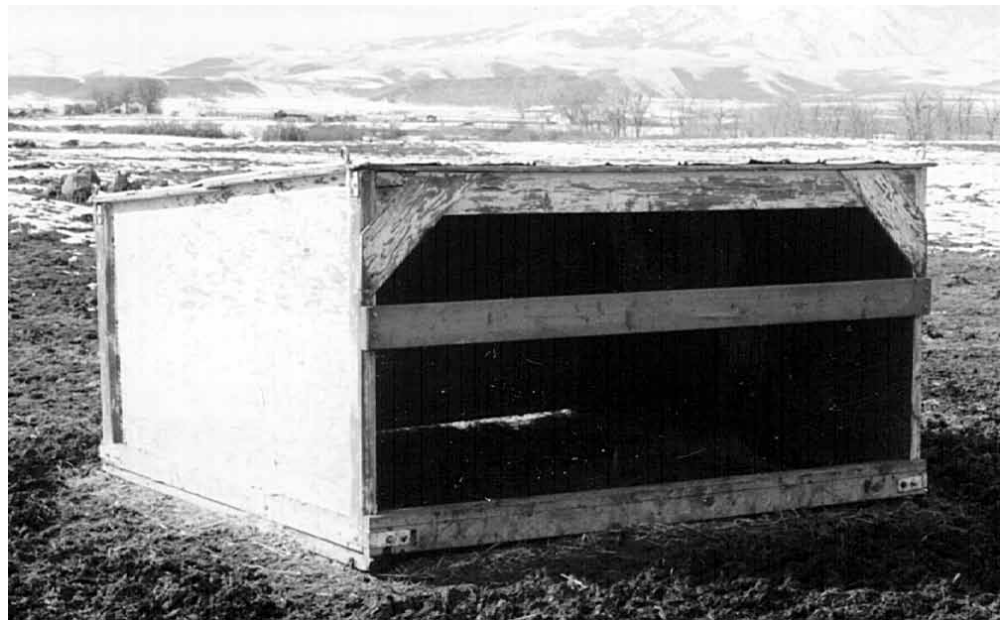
University of Idaho calf shelter modified with runners and additional bracing.
